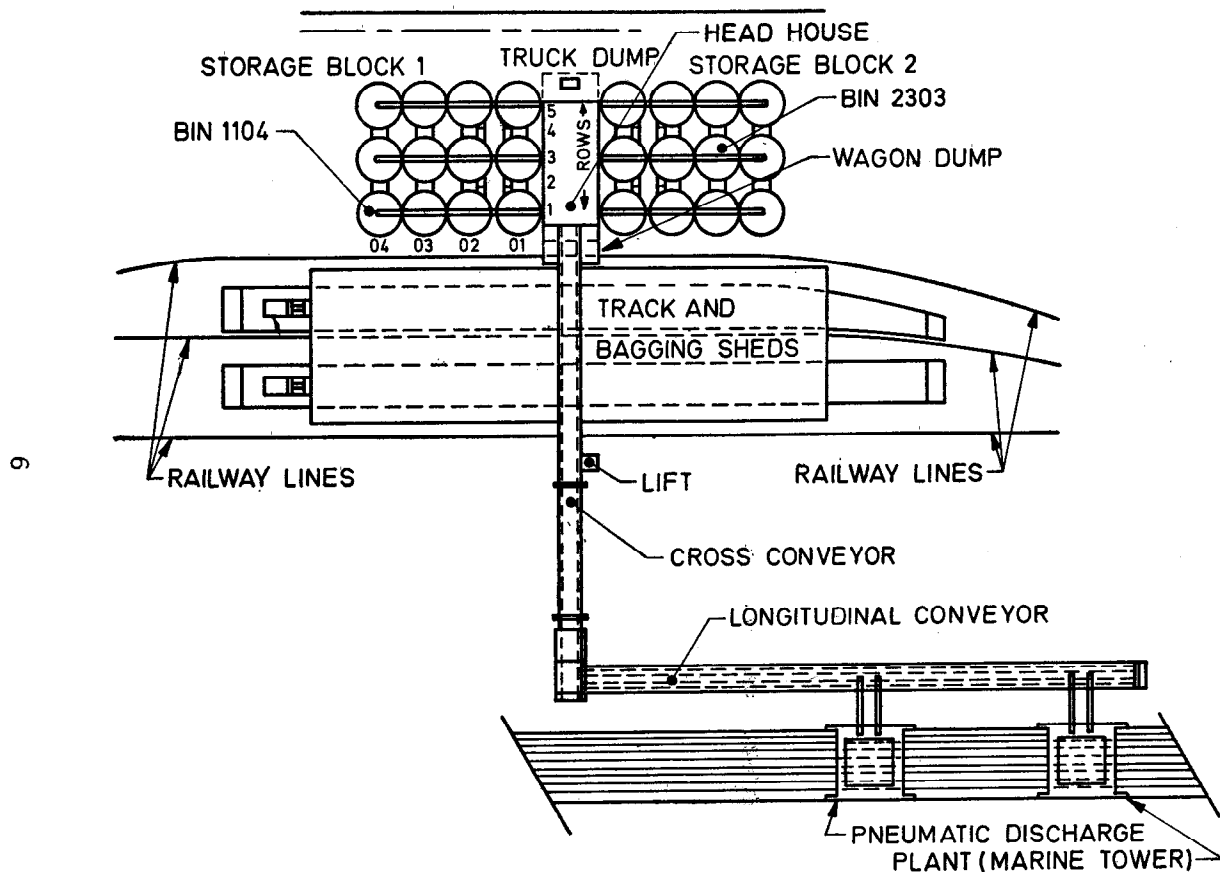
GENERAL LAYOUT PLAN FOR A GRAIN SILO
